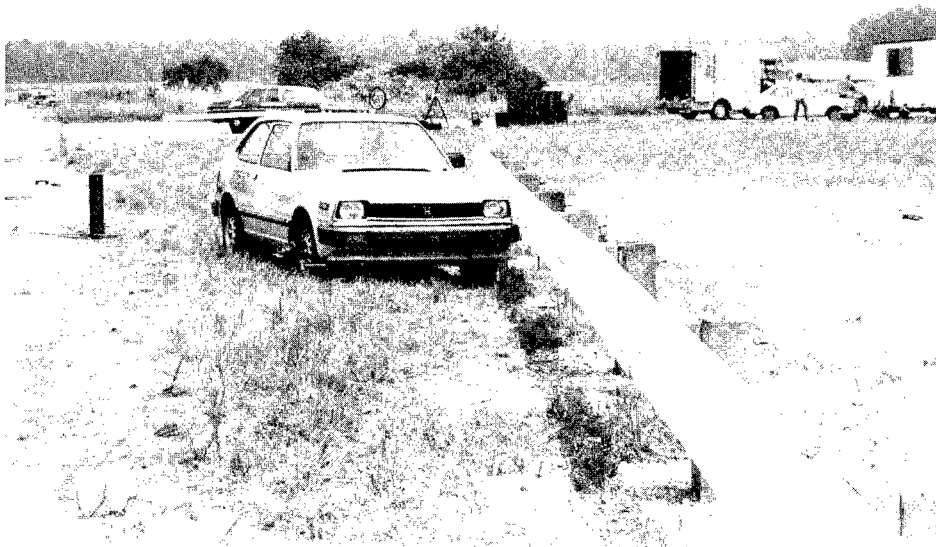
Pretest photographs of guardrail system, test 1818-5-1-87.
